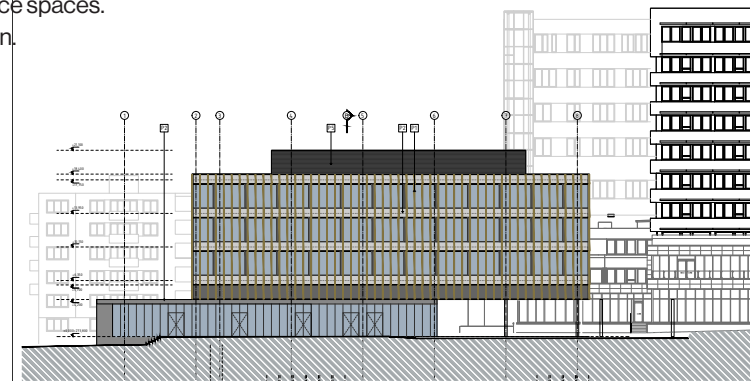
North-west view from Antala Staška Street, planning application documentation for the Budějovická Polyclinic – Delta Building. Author: H.A.N.S. stavby, a.s., July 2020
